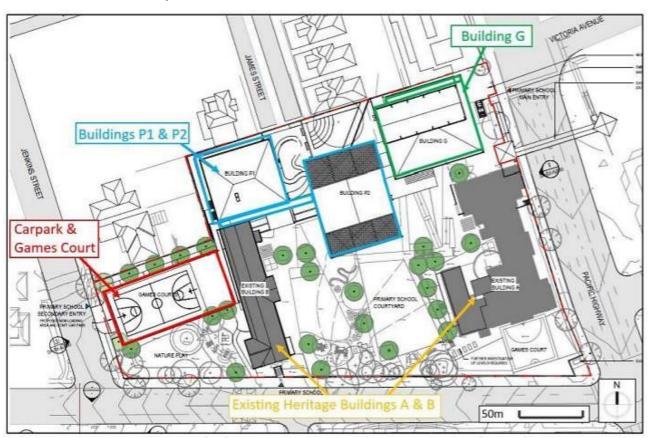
Chatswood Public School Site Plan (Source: RtS 2020)
